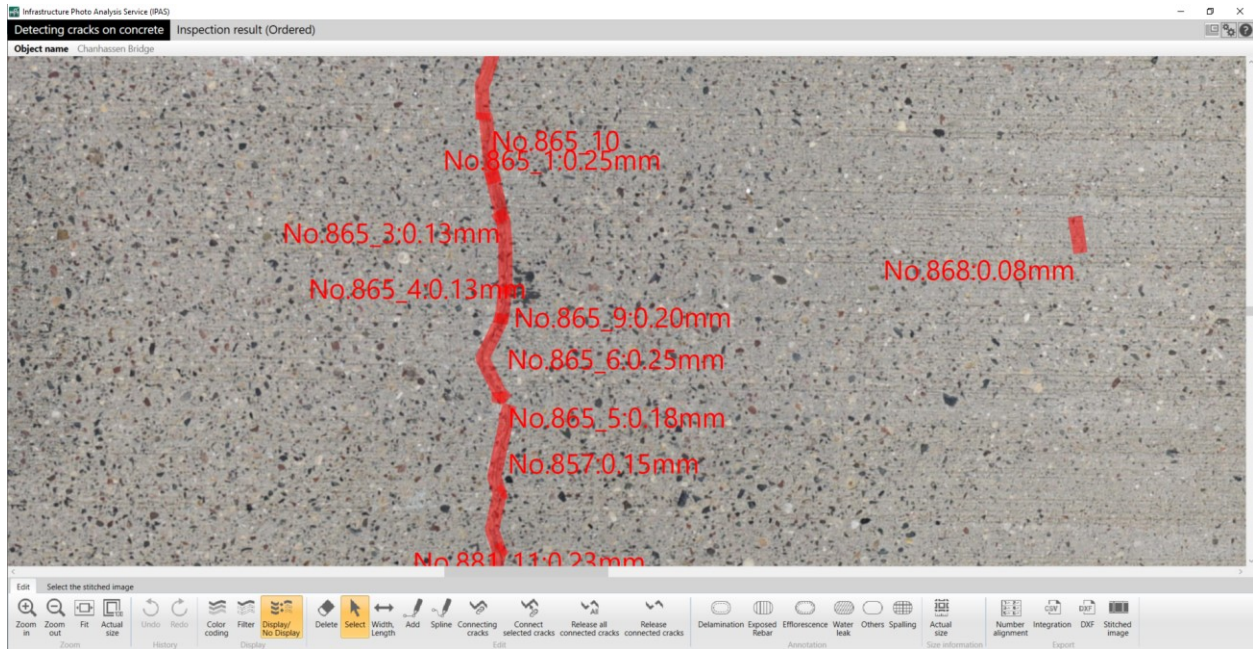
Fuji Film AI Crack Detection on Bridge
